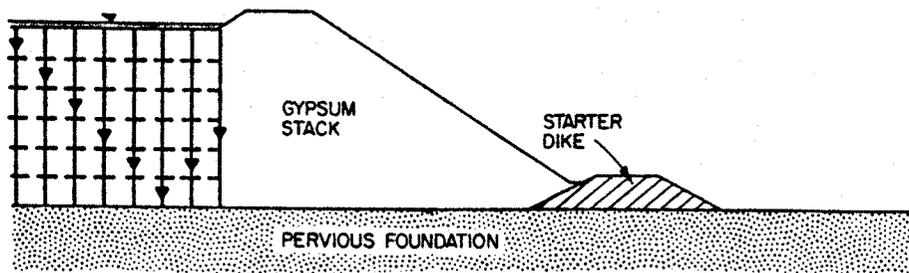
Seepage Pattern through a Gypsum Stack on a Pervious Foundation
